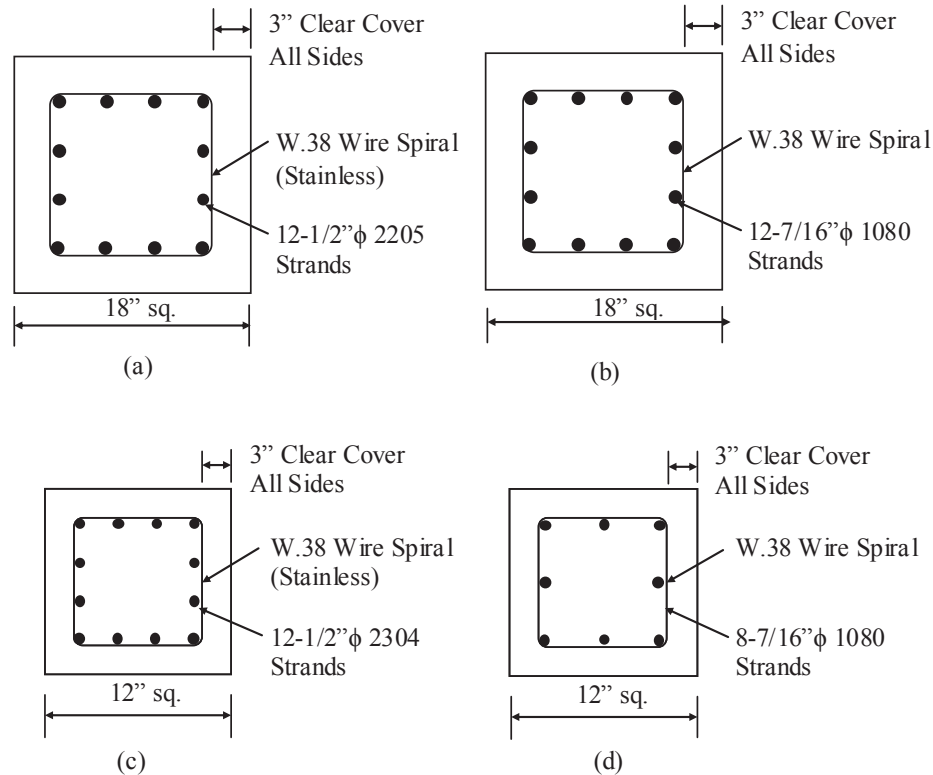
Cross sections of (a) 18-in. (46 cm) 2205, (b) 18-in. (46 cm) 1080, (c) 12-in. (30 cm) 2304, and (d) 12-in. (30 cm) 1080 piles
